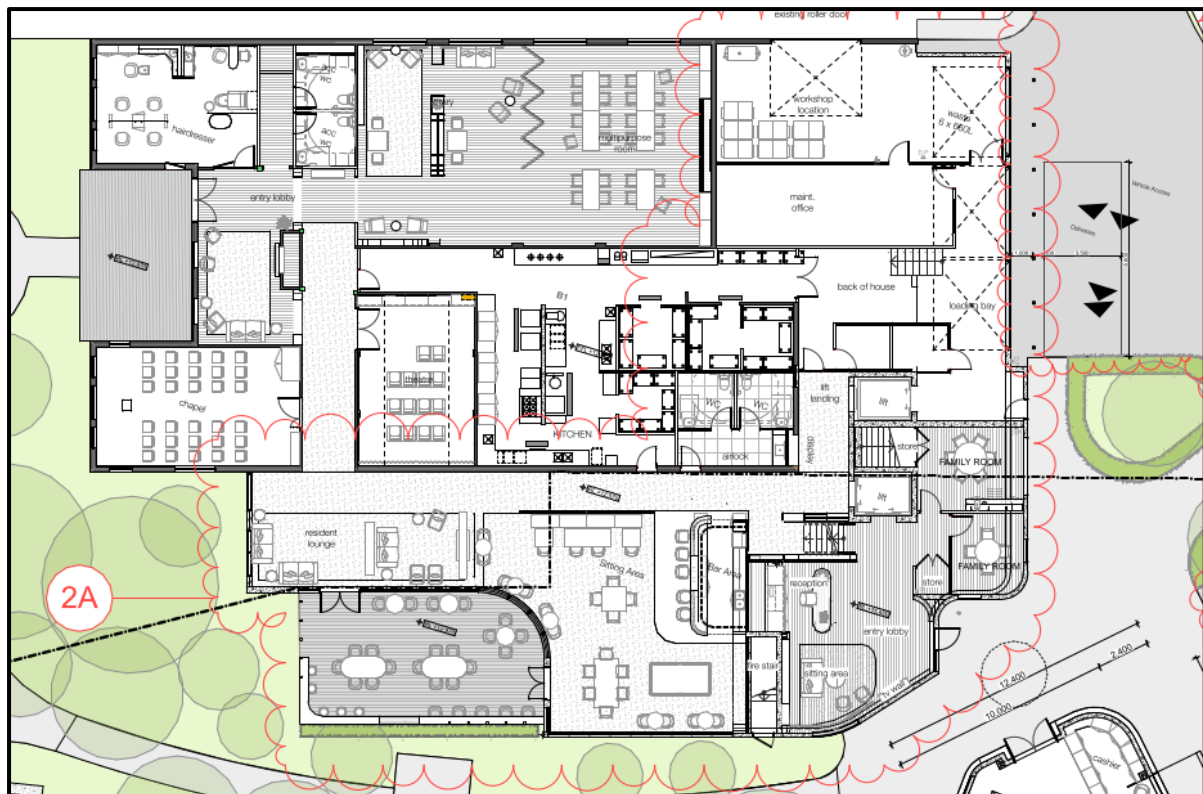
Proposed B1 Ground Floor Plan for Modification C
